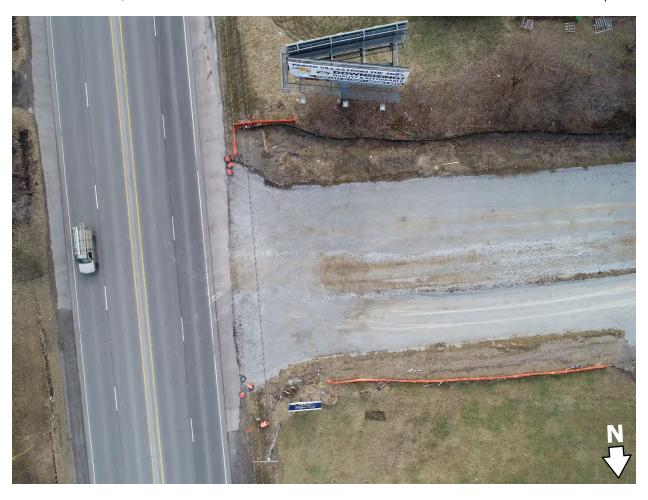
An aerial image of a newly constructed driveway off the western side of US 41. The image is oriented south by southwest.
